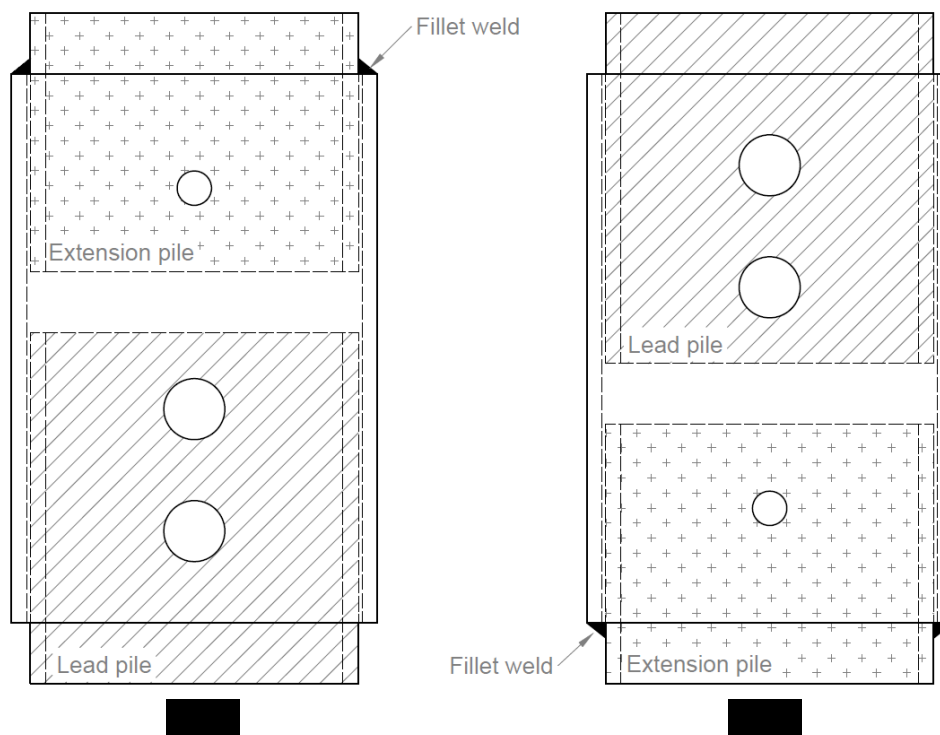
2. (a) Assembly position in field conditions. (b) Assembly position for tests.
